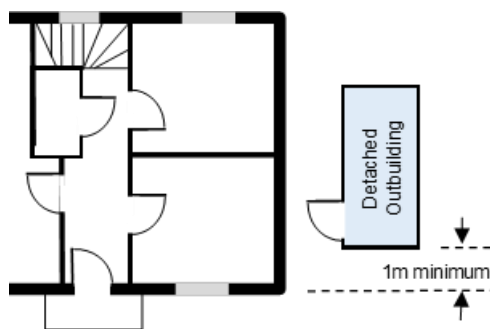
The street's character will be preserved by setting back garages and outbuildings.
